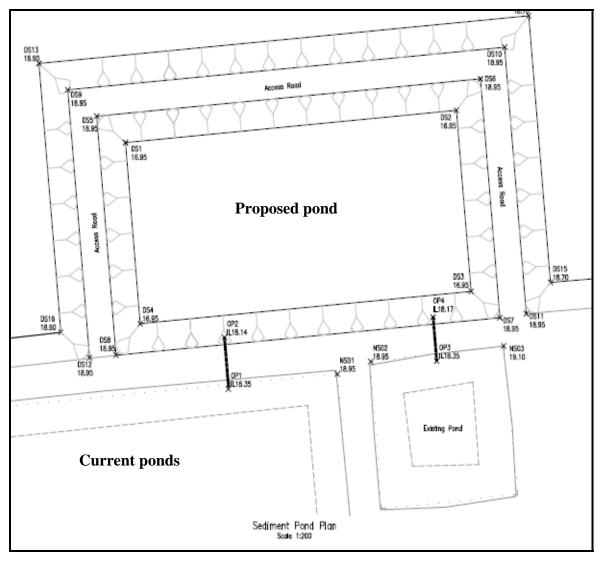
Liquid waste facility showing existing ponds and proposed new pond.
